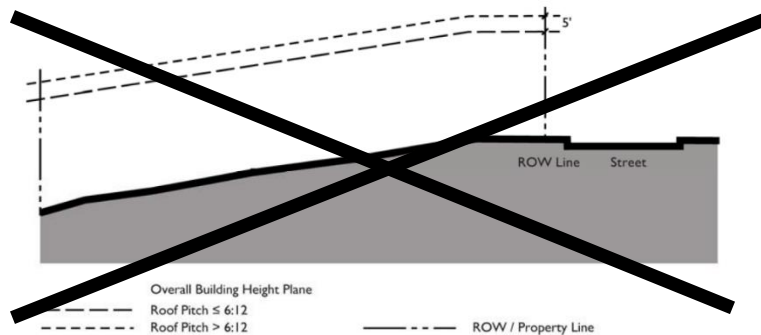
B. Pitched roof building height measurements (not drawn to scale).
